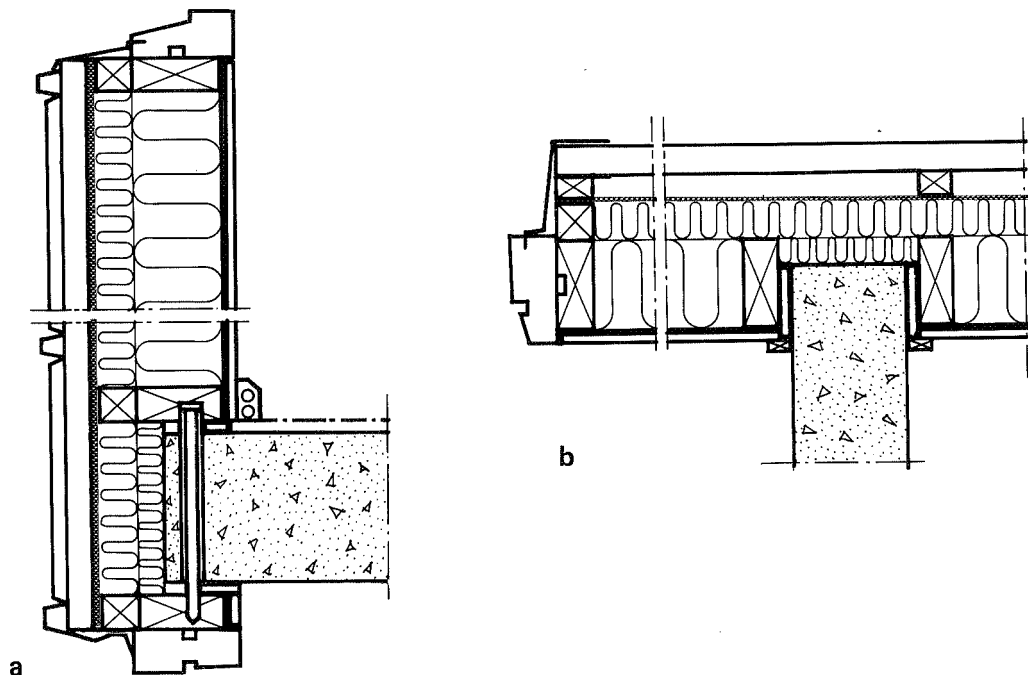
Examples of joints between curtain wall elements, joist structures and intermediate concrete walls. Suitable air sealing at joints is achieved with polyurethane foam. In the facade elements investigated the window frames were attached with adhesive to the framework. This has obviously provided good airtightness. However the method has several disadvantages and has now been rejected by manufacturers.
